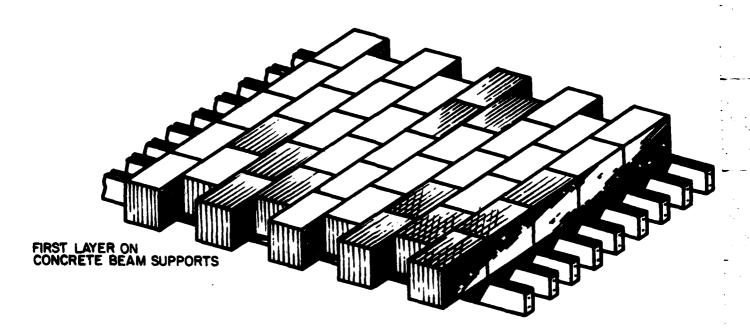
Precast concrete beam supports. (From Drawing 1, Information Bulletin [B. F. Goodrich].)
